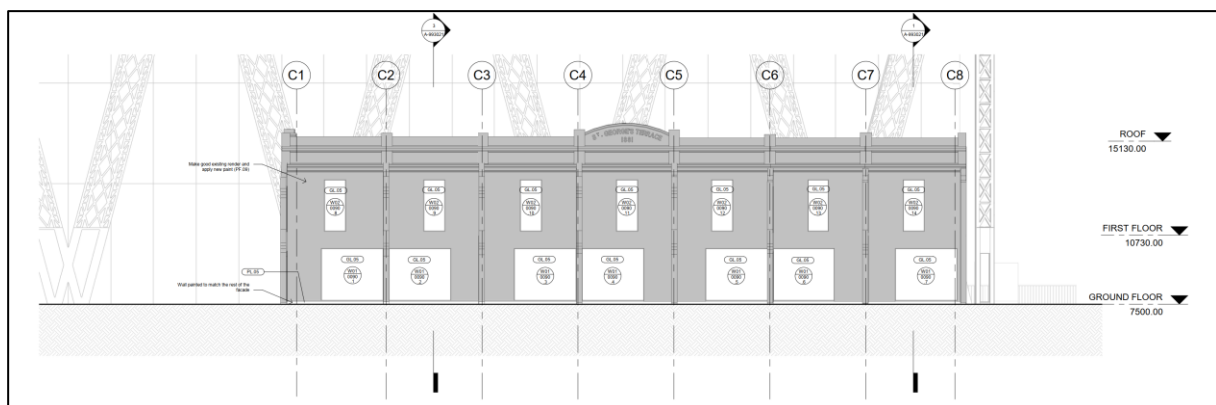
Proposed south elevation (Source: Genton, 2021).
